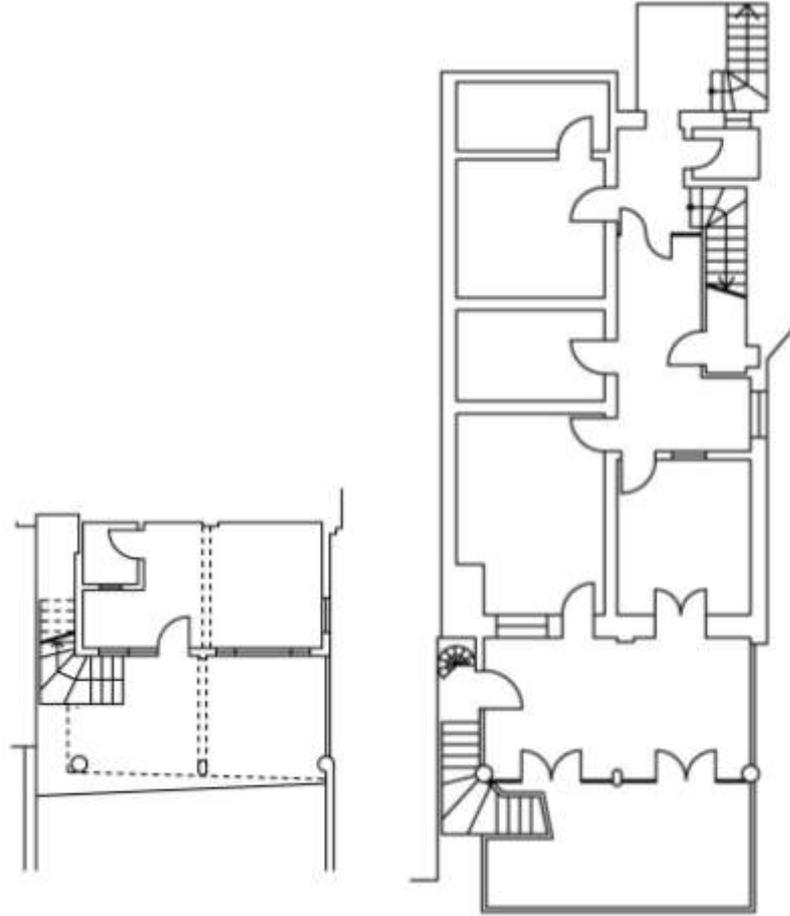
Second and first basement floor plans of the house at 124 lot 3 parcel
